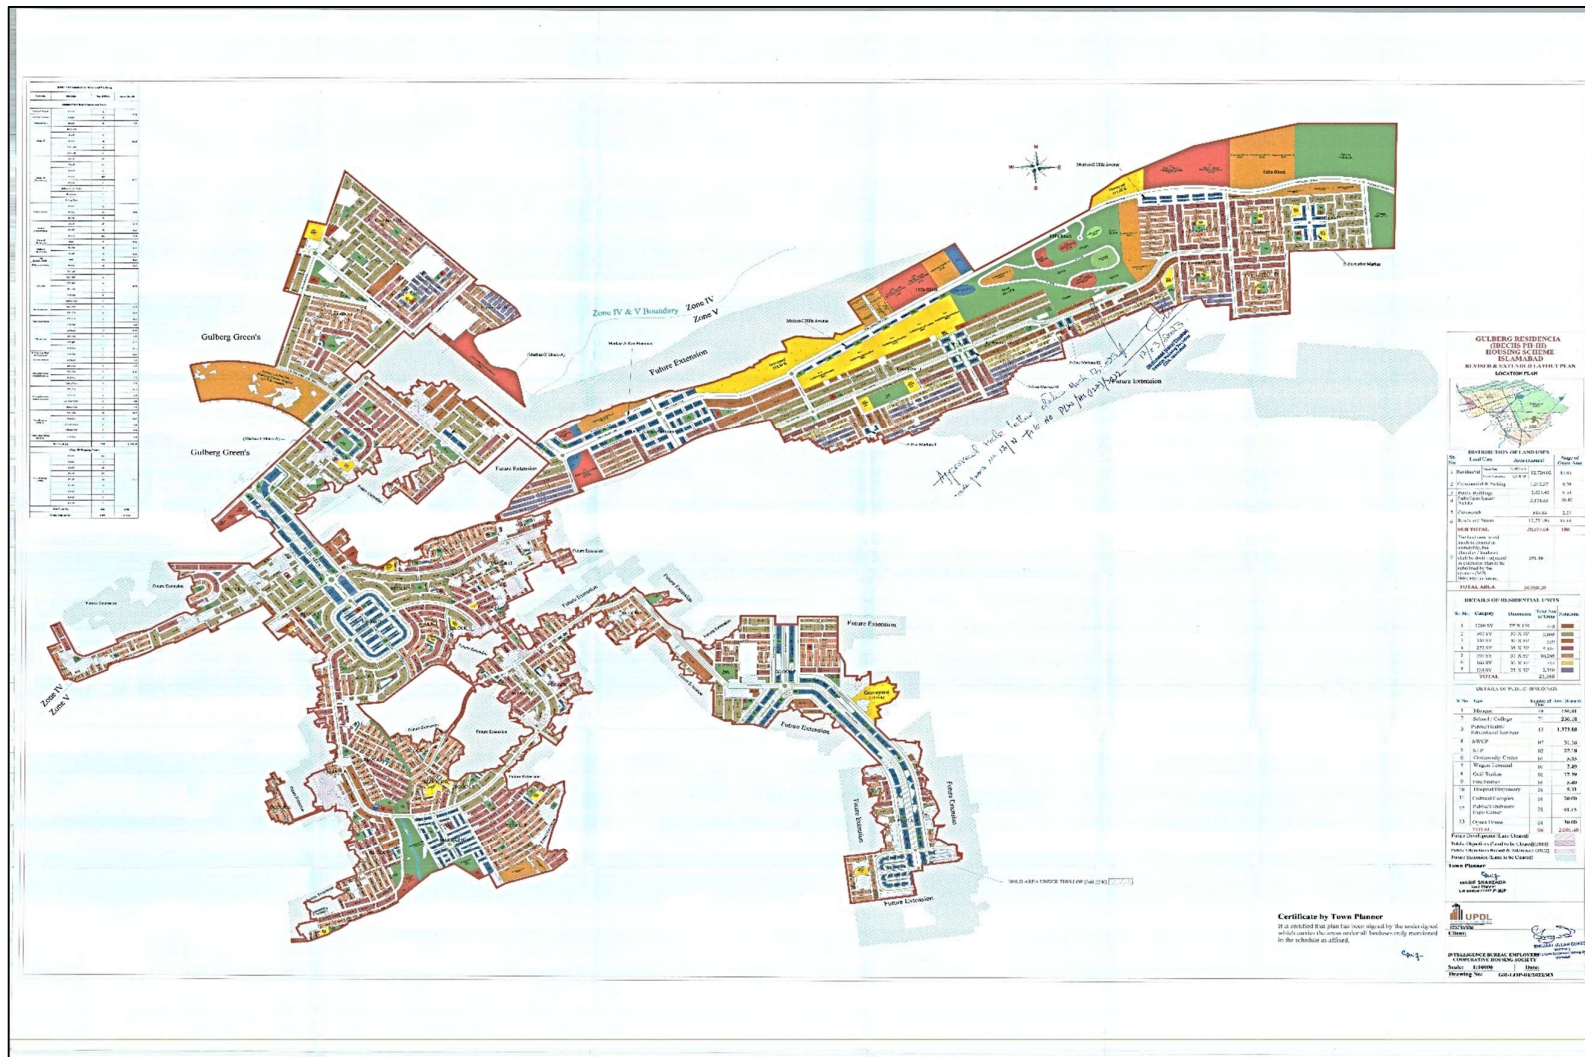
LAYOUT PLAN OF GULBERG RESIDENCIA (REVISED & EXTENDED)
